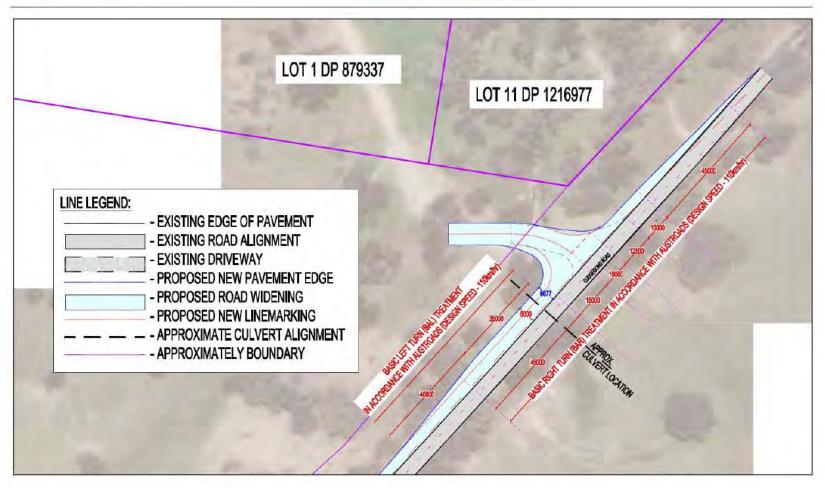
PROPOSED CUDGEGONG ROAD / SITE ACCESS INTERSECTION LAYOUT (CONCEPT)
